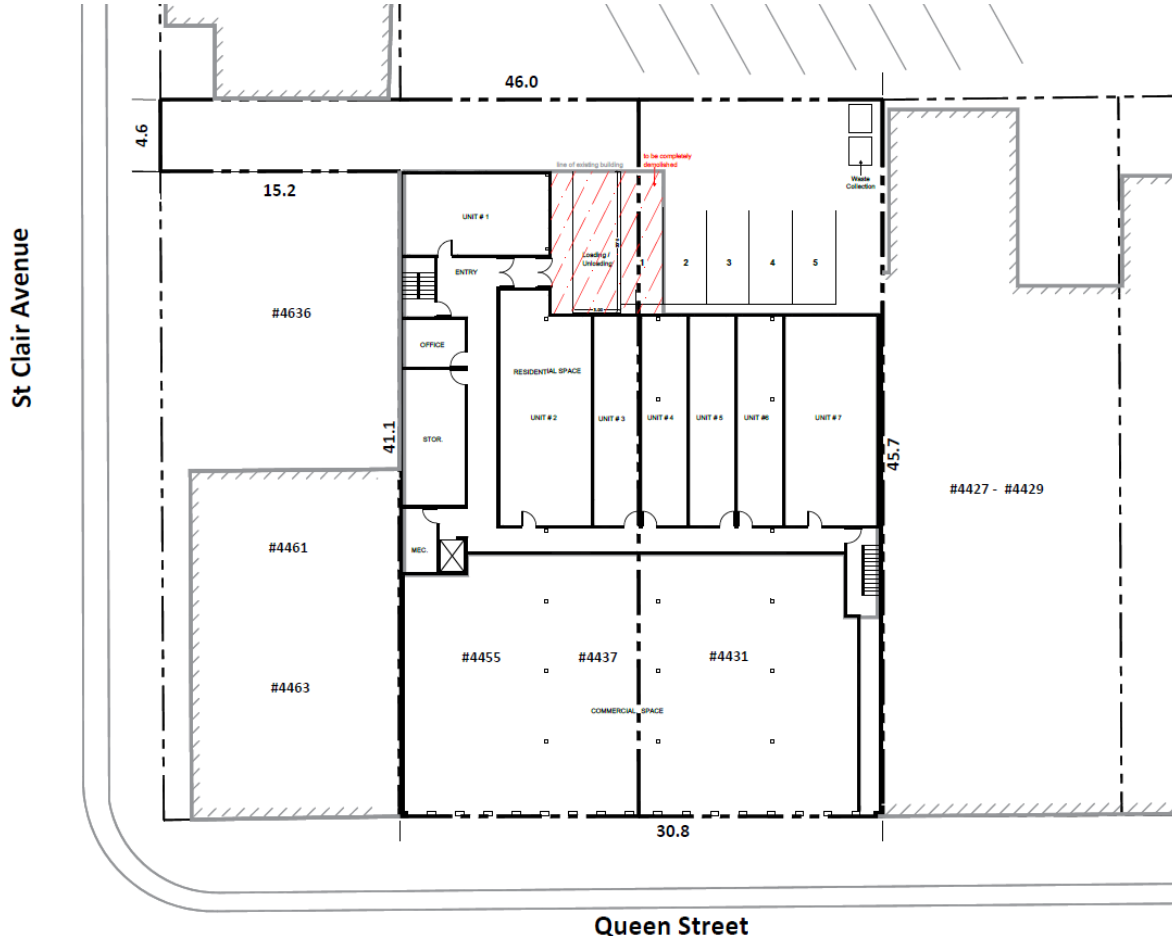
Proposed Site Sketch, Better Neighbourhoods Inc.
